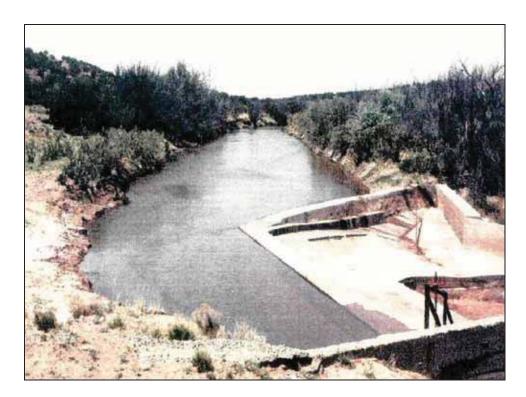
Diverted water approaching spillway and headgate, before the breach. (Photograph courtesy of the West Puerto de Luna Acequia Association).
